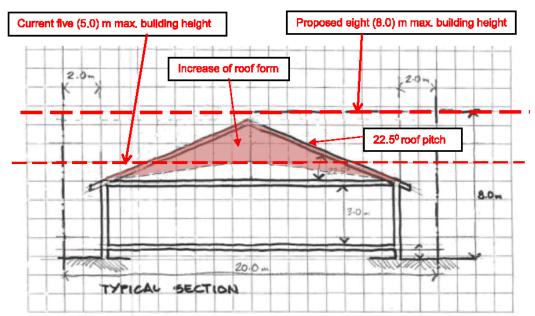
The shaded roof form indicates the potential increase of building form of the eight (8.0) metre maximum building height over and above the current five (5.0) metre building height @ 22.5° roof pttch
